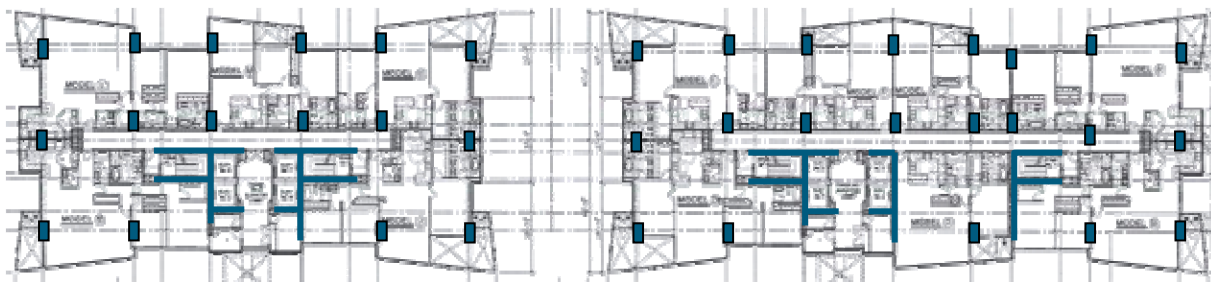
Column and Shear Wall Layout for Typical Apartment Level
